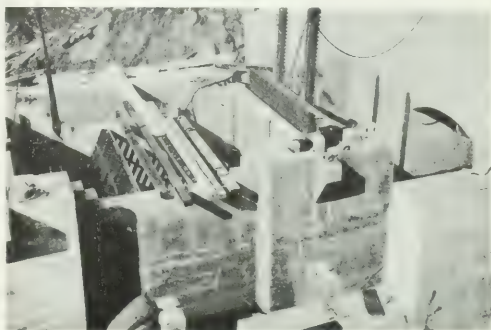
FOREBAY BEFORE COMPLETION, SHOWING PORTAL OF TUNNEL NO. 19.
